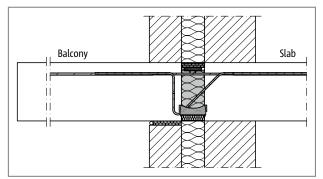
Schöck Isokorb® T type K: Cavity wall with a balcony at inner slab level
